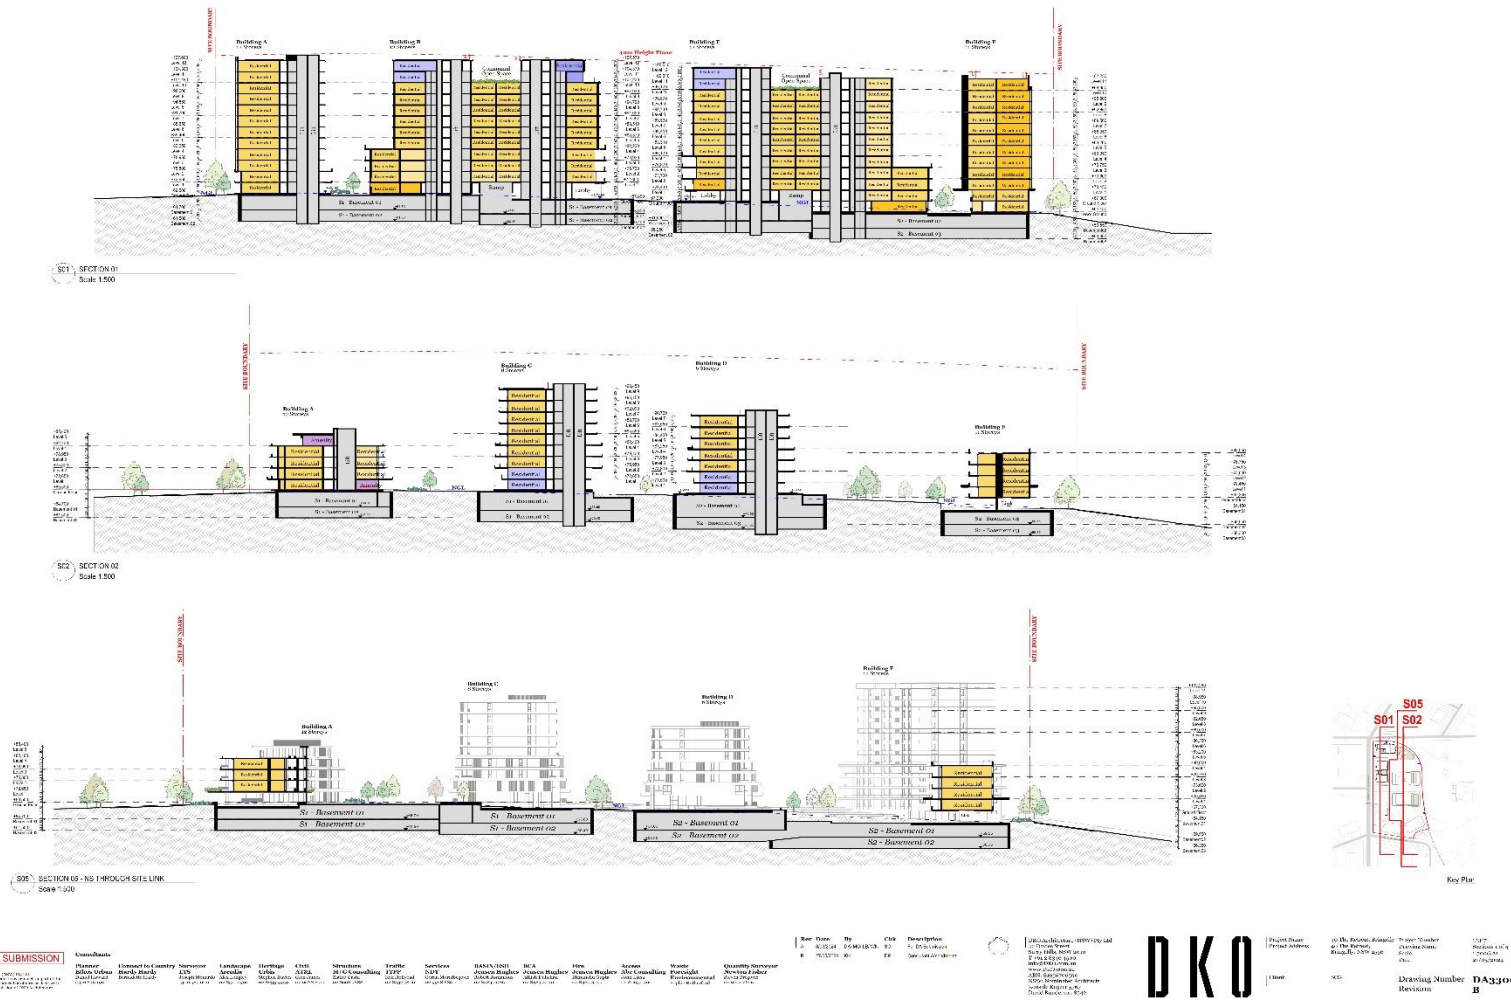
Section drawing showing the layout and planned development for each building (DKO 27 May 2024)⁹
